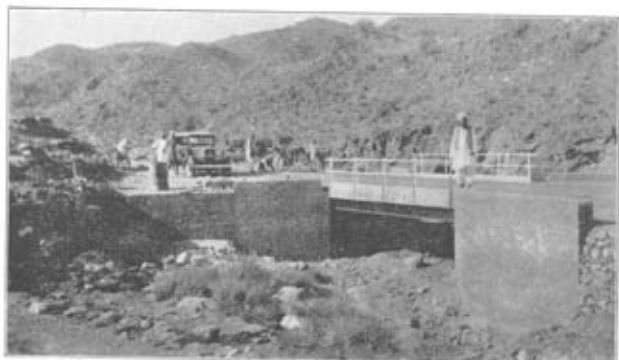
Bridge work. 21-foot R.S.J. span on brick abutments.
